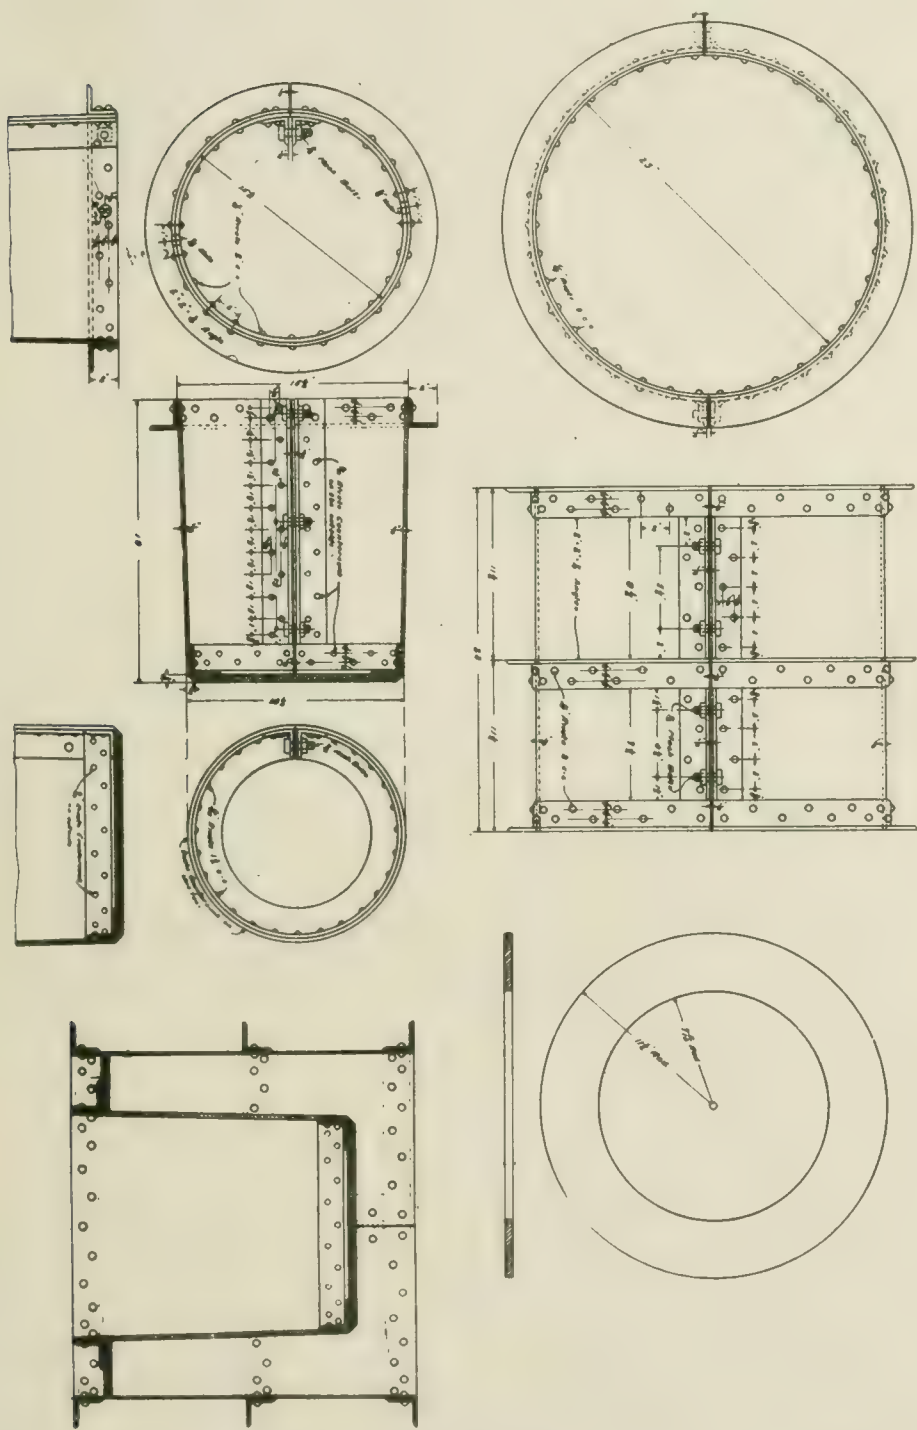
STEEL FORMS USED IN CONCRETE TEST TANKS IN OIL PENETRATION EXPERIMENTS.
